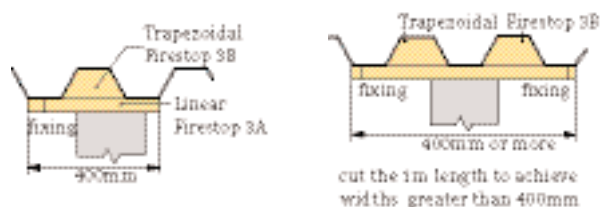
Metal deck with profiles positioned asymmetrically to wall
